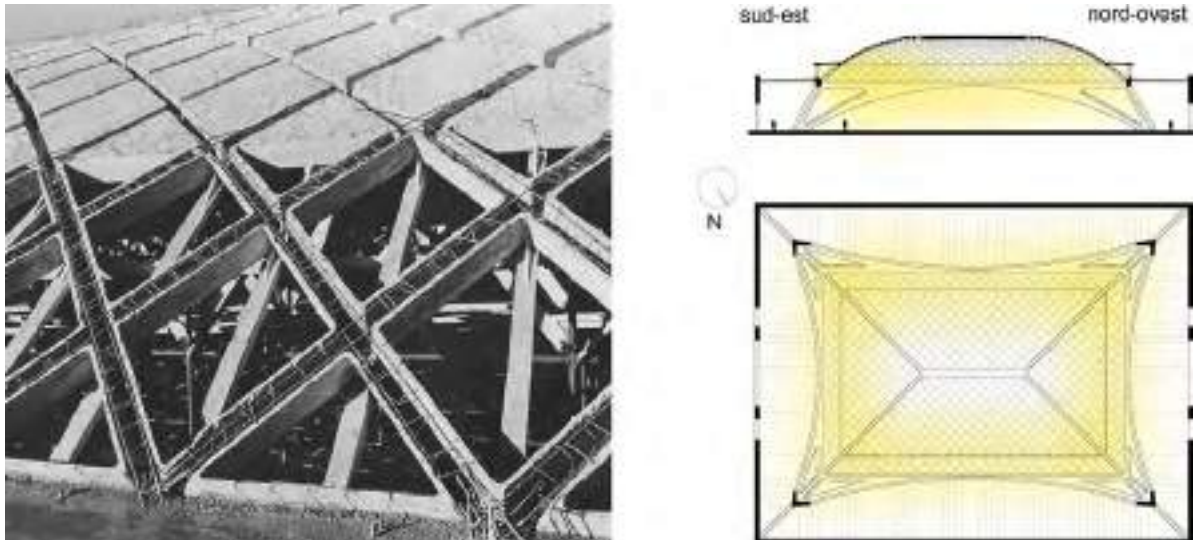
The Salon C under construction, detail of the precast ceiling (TSLF). Fig. 19. Plan and section whit the study of the light (AB).
